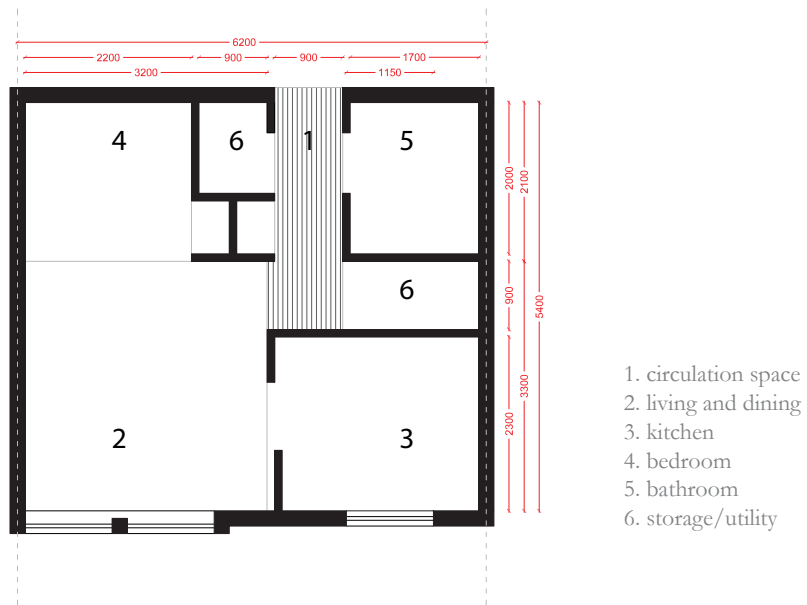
Current floor plan (scale 1:50) and organization scheme of the 1b1p-flat
